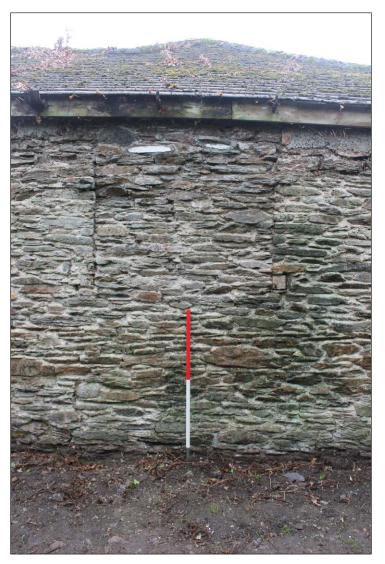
East external elevation showing blocked window, looking west. 1m scale
